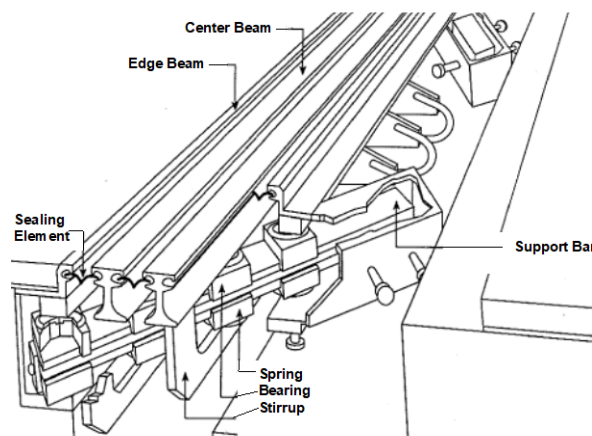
Cut-away View of a “Swivel Joint,” i.e., a Special Type of Single-support-bar (SSB) Modular Bridge Joint System (MBJS) with a Swiveling Single Support Bar
